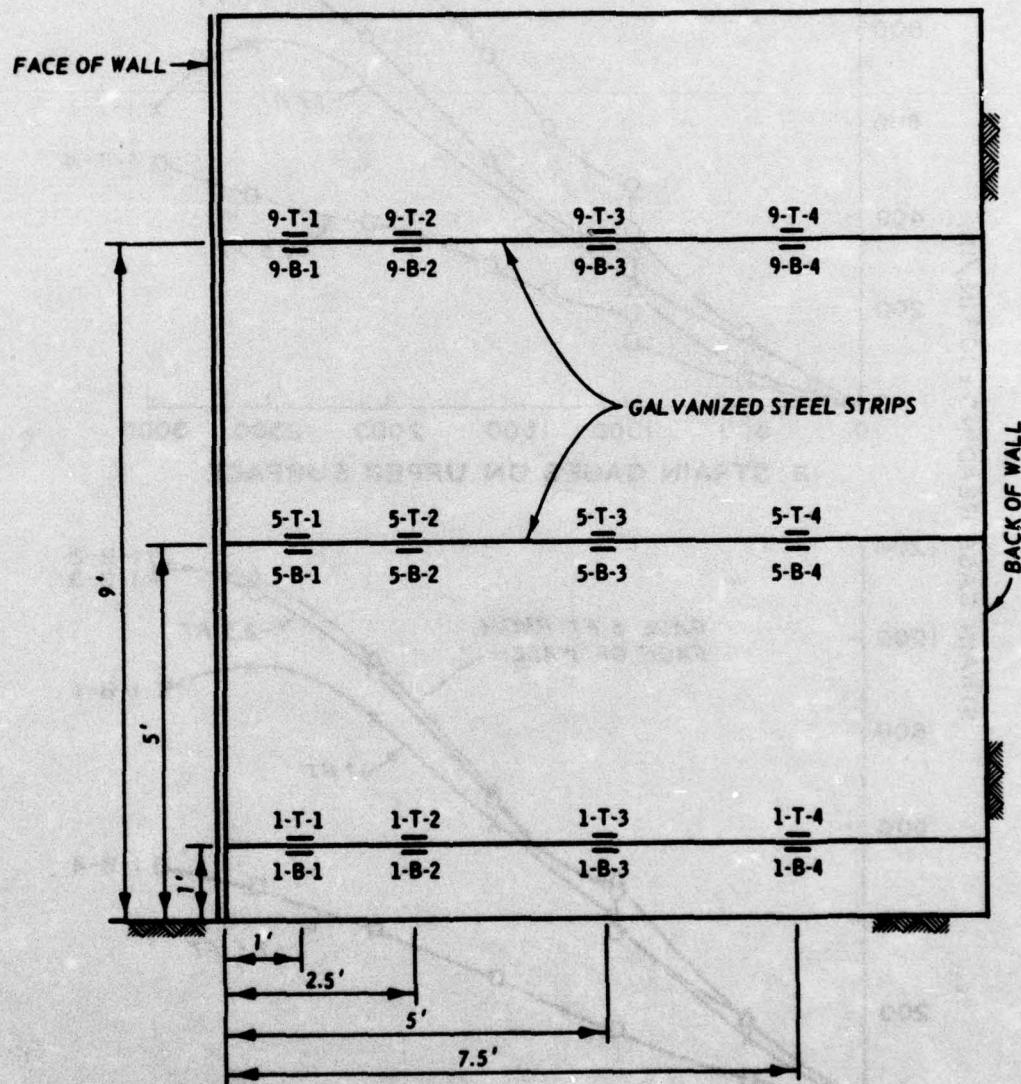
Layout of SR-4 strain gages on the galvanized steel strips along the center line of the reinforced earth wall
